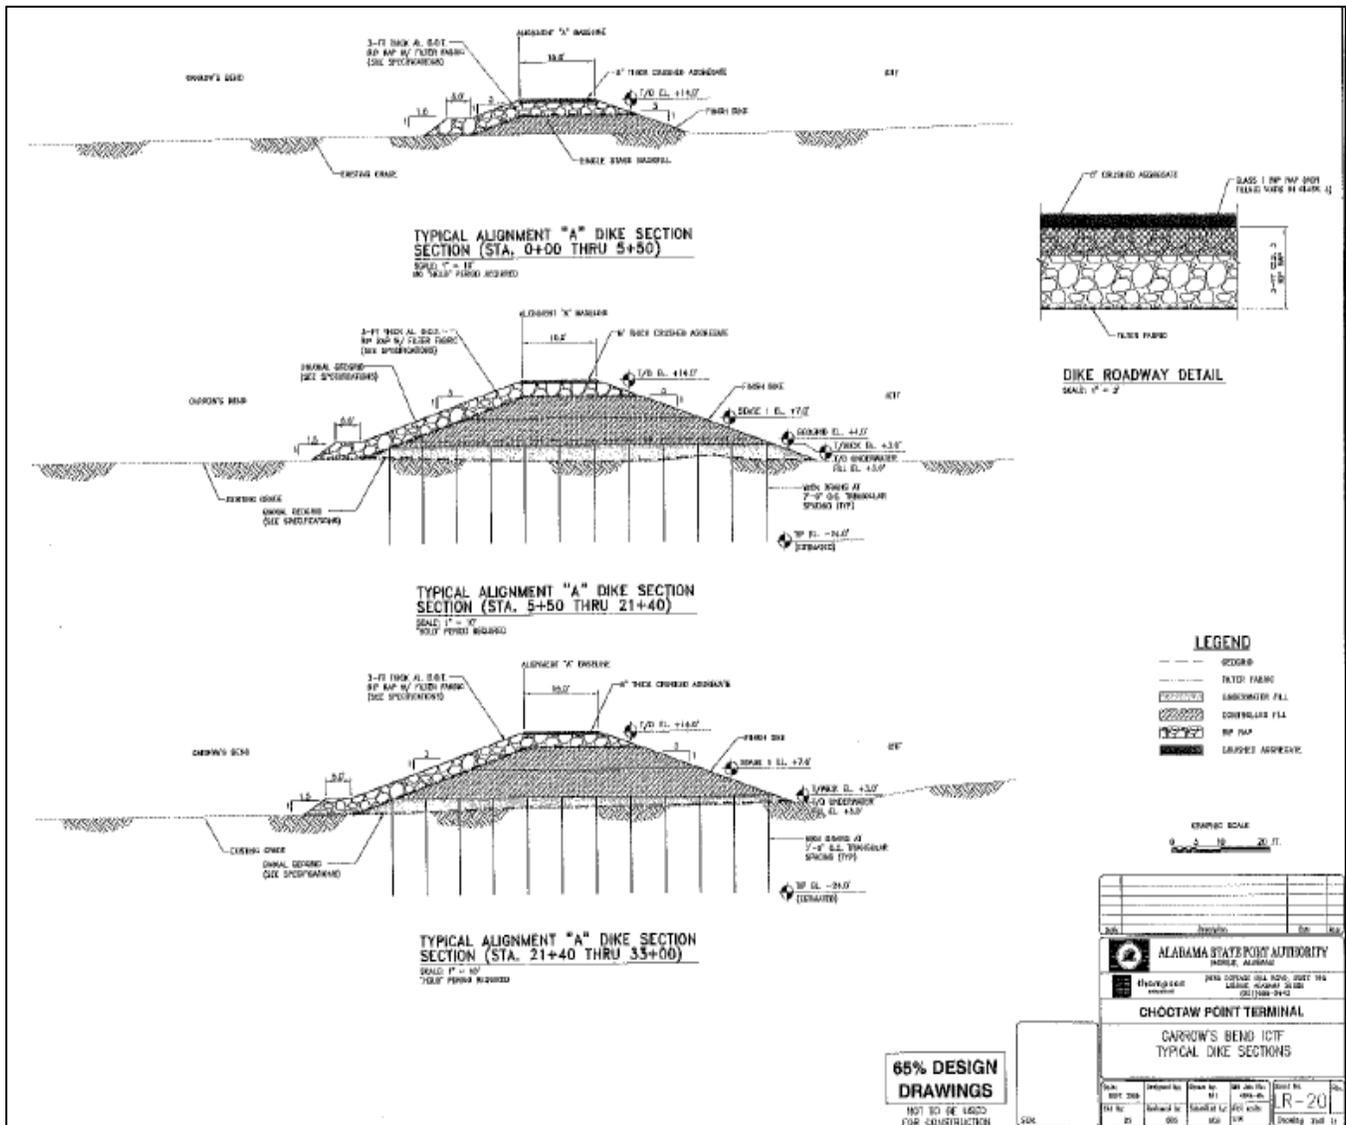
Cross sections of dikes to be constructed at the Garrows Bend Disposal area
